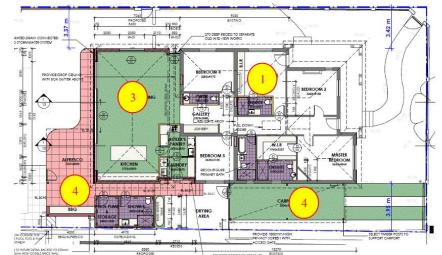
Proposed Ground Floor Plan – DWG 05 Rev B (Source: DS407 Design Studio)
